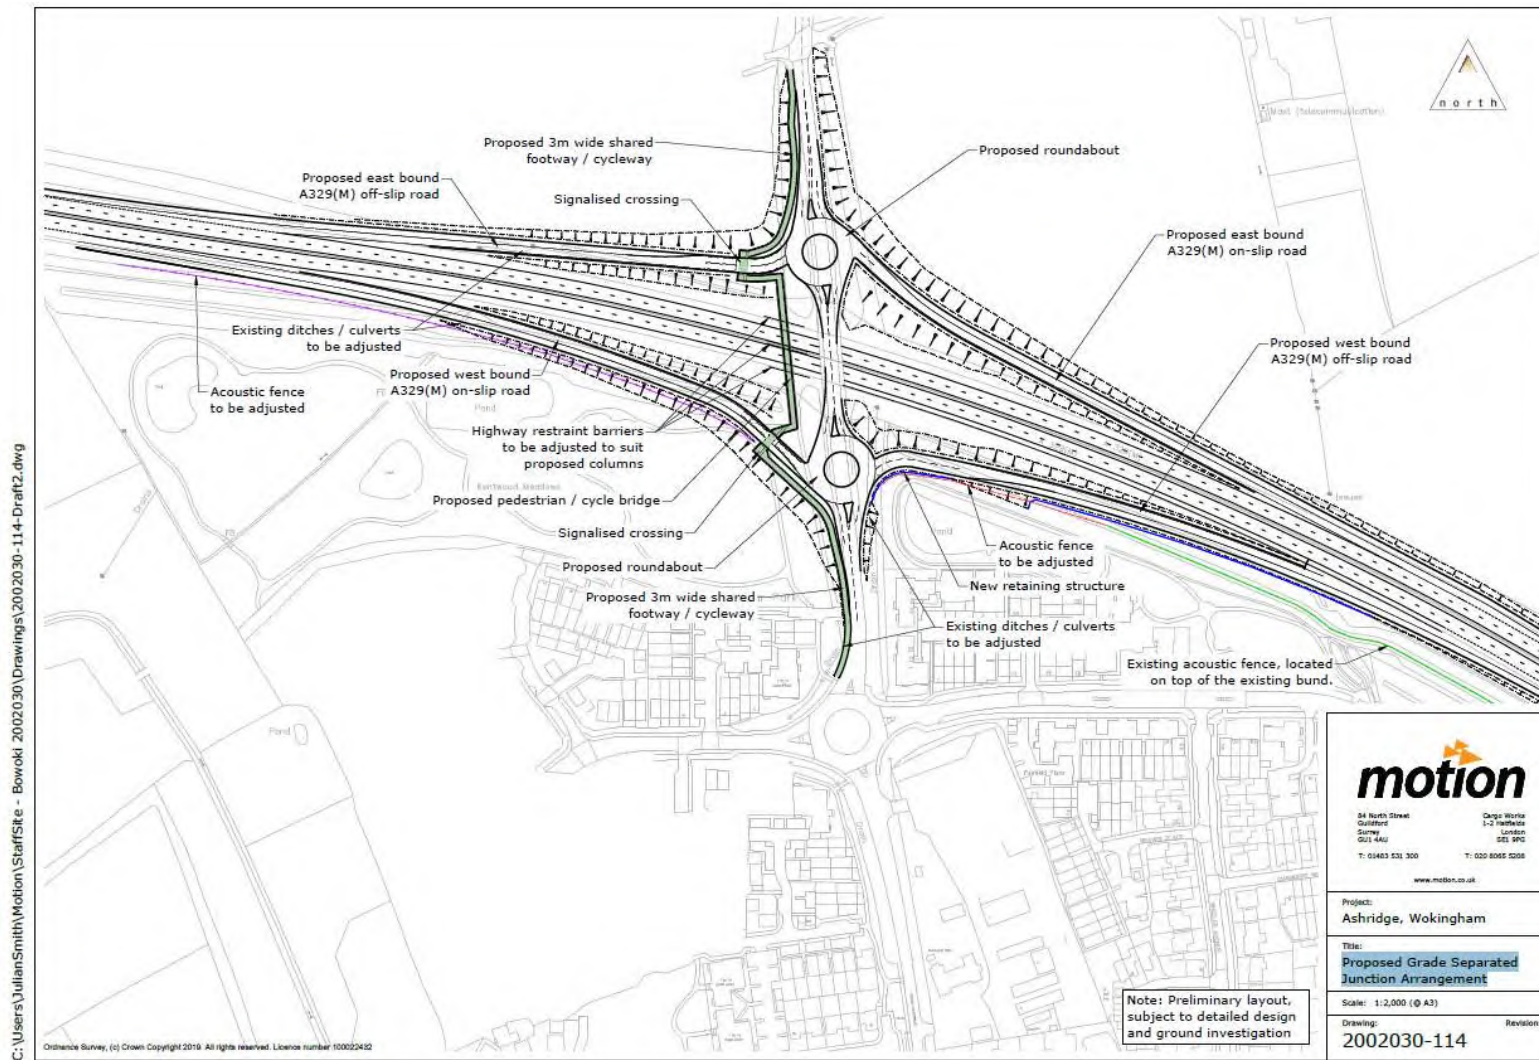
Proposed Grade Separated Junction on A329(M) – East and west -facing slips
